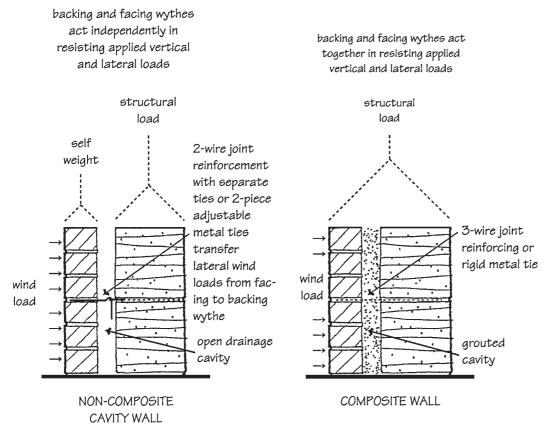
Load distribution in multi-wythe composite and non-composite walls. (From Beall and Jaffe, Concrete and Masonry Databook, McGraw-Hill, New York, 2003.)
